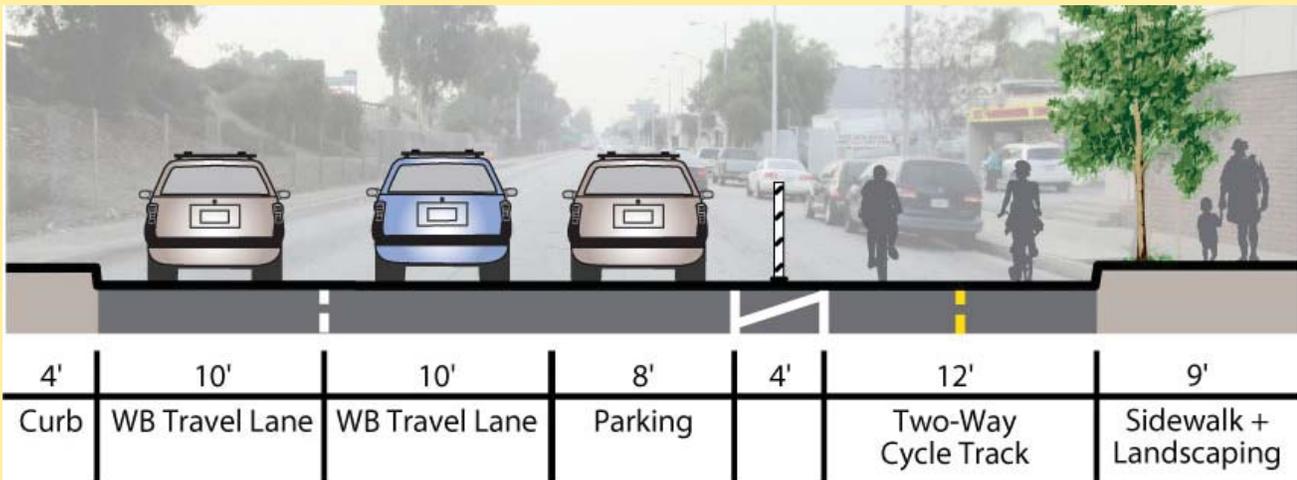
Existing & Alternative Street Cross-Sections for Pomona Boulevard
